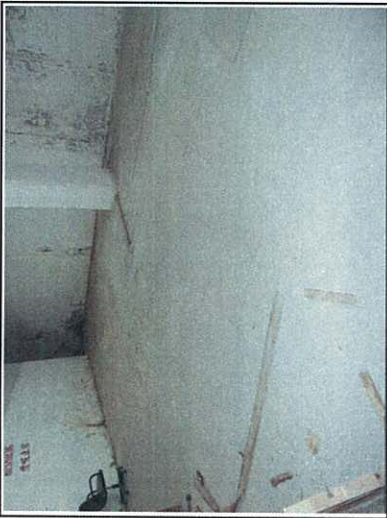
The floor slab of the Sub-Lower Ground Floor. No visual evidence of spillage/staining was observed.
